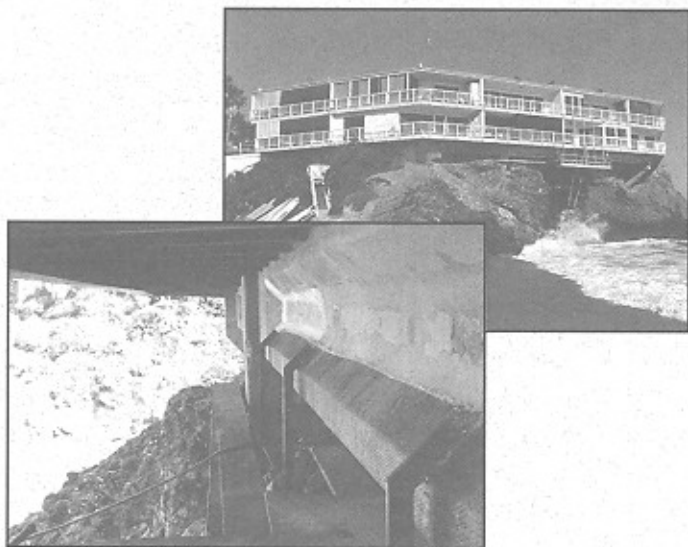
Repair of Supporting Beam of Apartment Building, Laguna Beach
